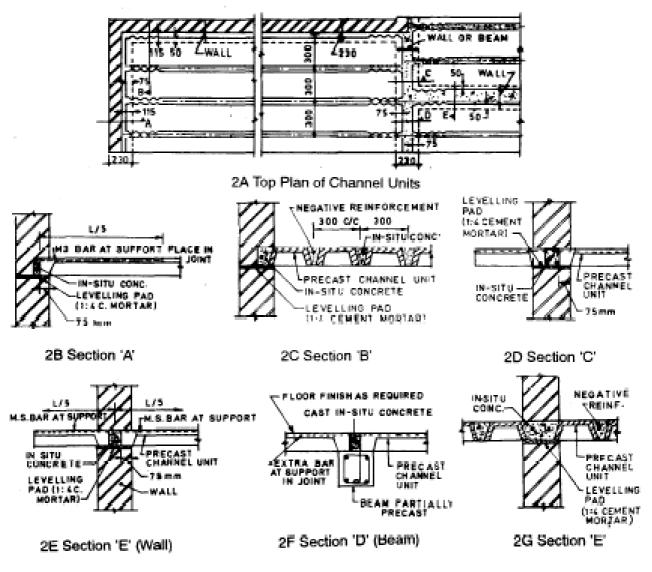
DETAILS OF JOINTS IN A FLOOR WITH CHANNEL UNITS
